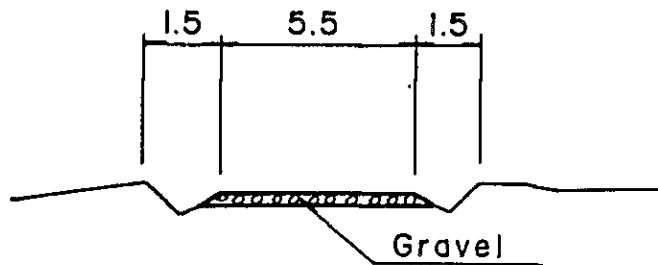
Cross-Section of Road Structure (From Azüero Port to Junction of Monagre/Erejido Road)
